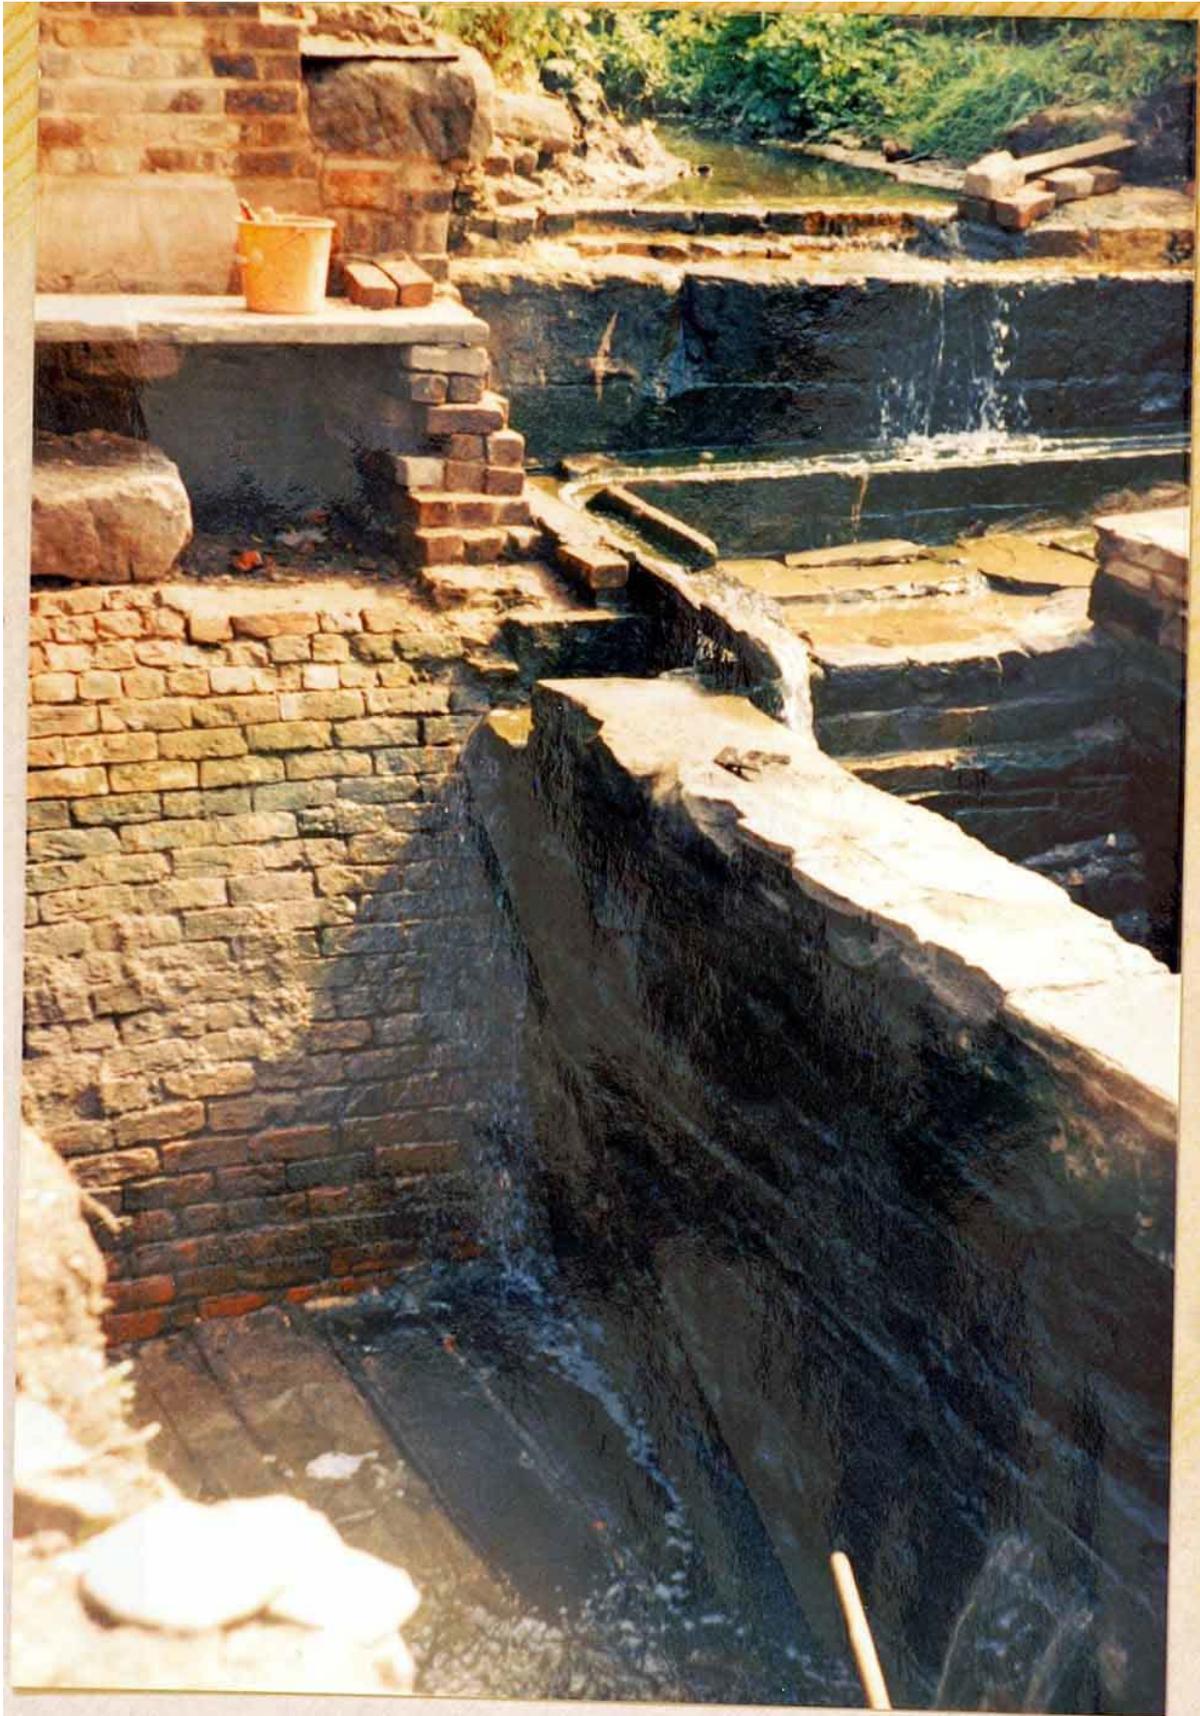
Detail of east end of northern wheel pit (Structure 3) from the north-west. Although the southern wall is in shadow it appears to be constructed in coursed gritstone rubble similar to that used for the north wall. The timber flooring can be seen at the base of the pit. . Photo D. Knowles.
